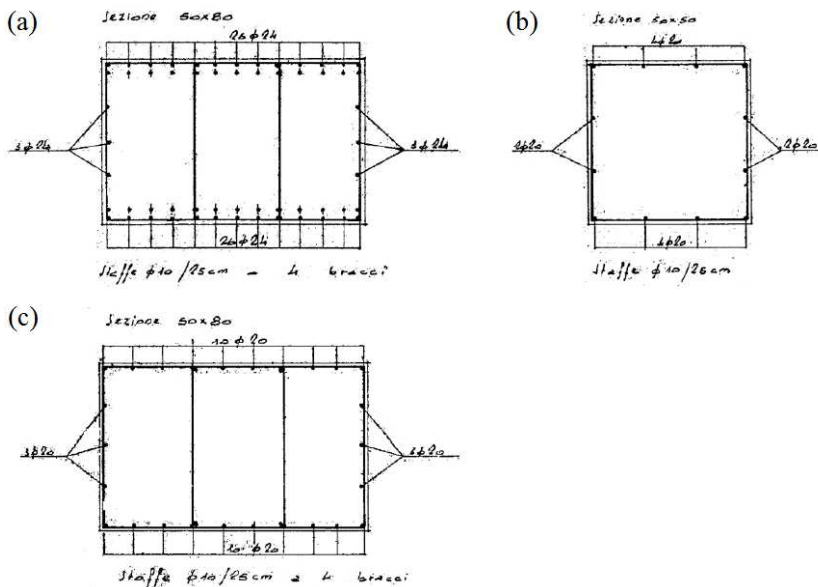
Columns cross-sections at the basement floor: (a) primary C-P1, (b) auxiliary C-P4, and (c) auxiliary C-P5 (adapted from original drawings)
